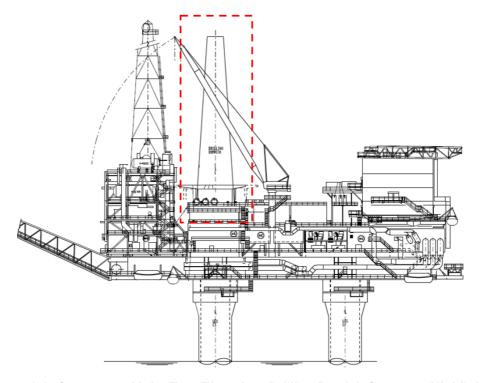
Cormorant Alpha East Elevation, Drilling Derrick Structure Highlighted
